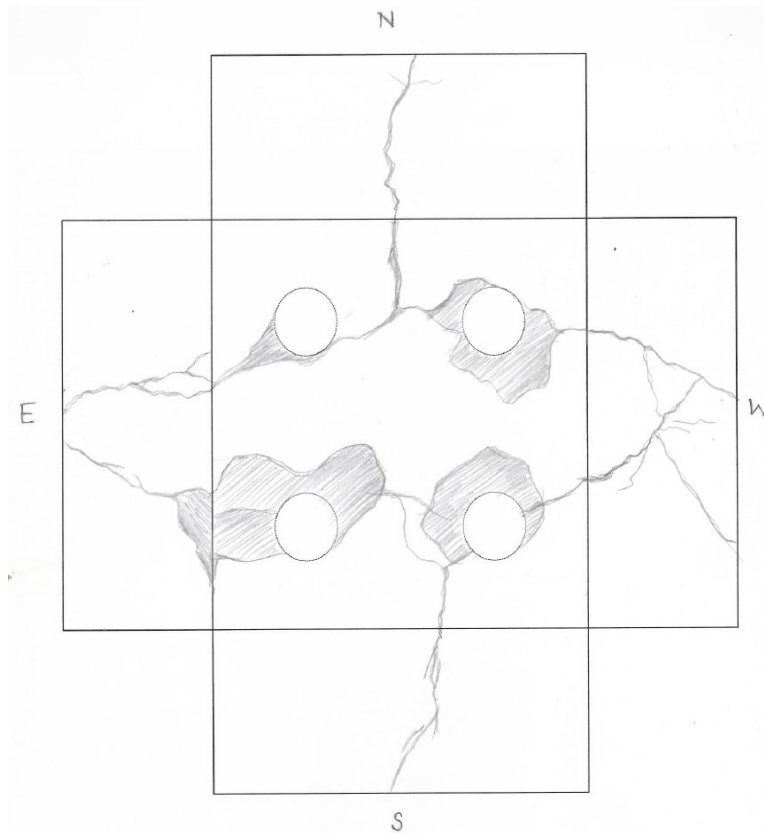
Specimen R-S-R-LTi-90-Pile: Column at the end of testing (at approx. 4% total drift level), limited cracking in column, large cracks in footing
